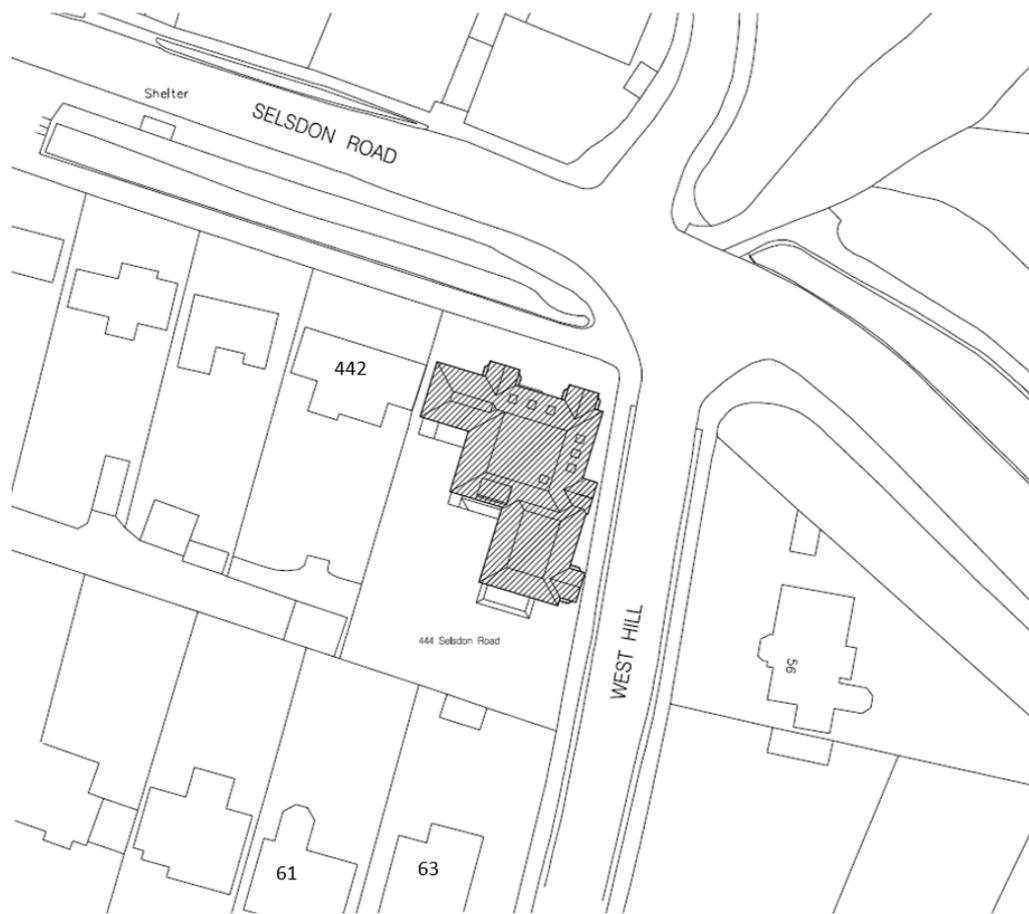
Proposed Block Plan highlighting the relationship with the adjoining occupiers.
